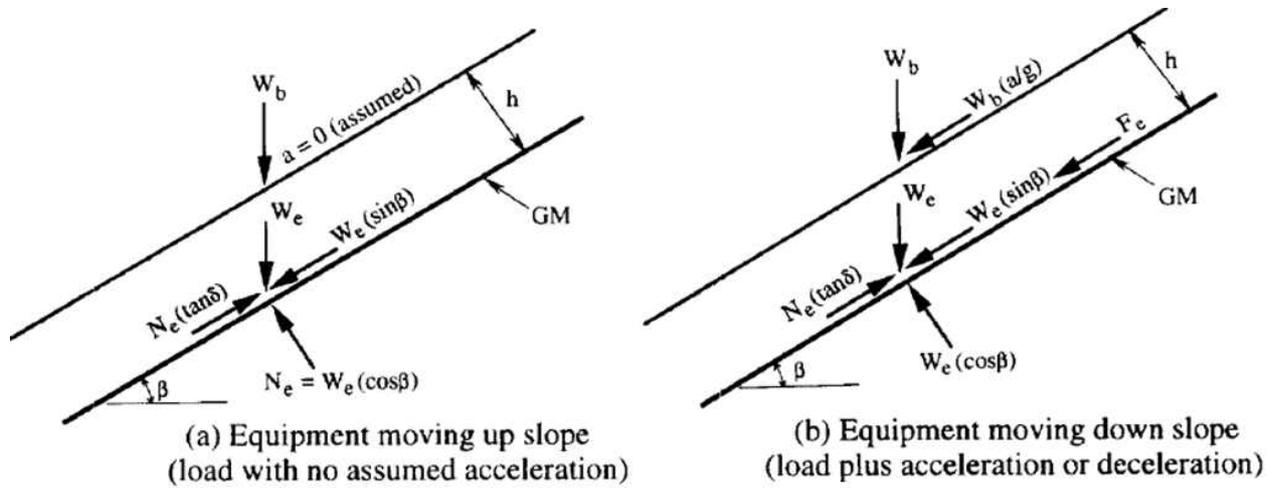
Additional limit equilibrium forces due to construction equipment moving on cover soil, see Figure 3 for the gravitational soil force to which the above forces are added (from Koerner and Soong, 1998)
